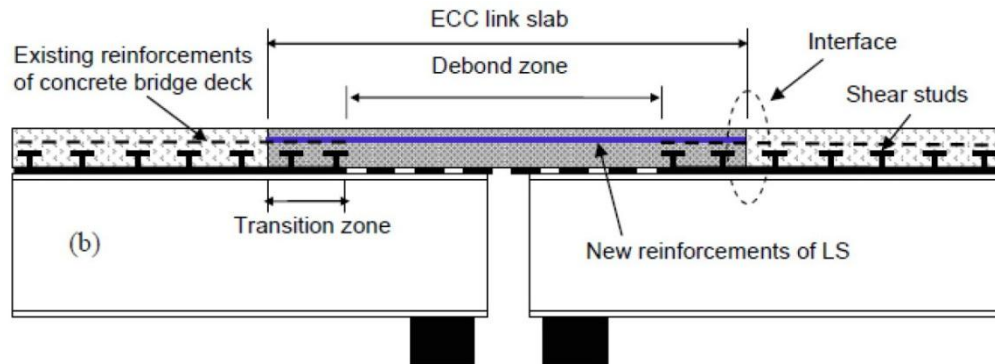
Typical flexible link slab (Lam et al., 2008)
